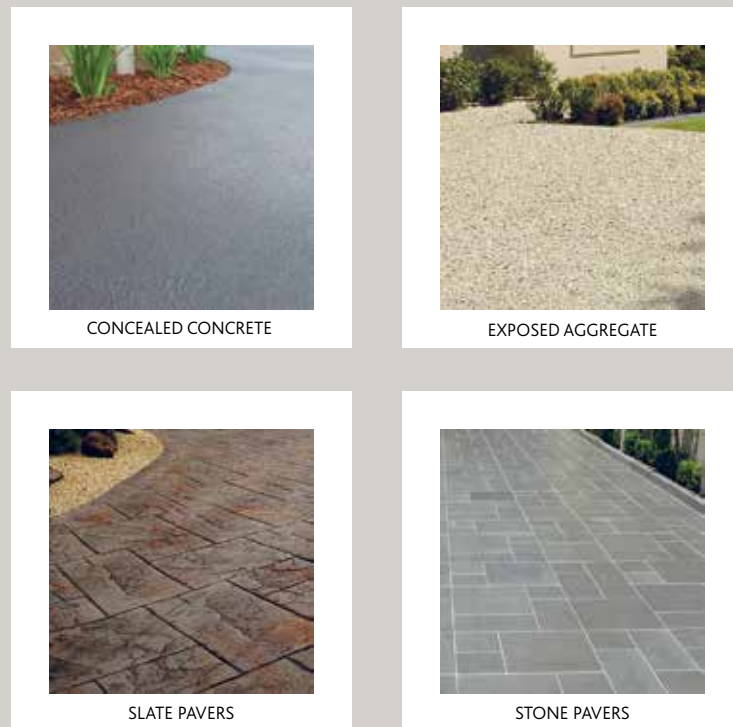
ACCEPTED DRIVEWAY MATERIALS
